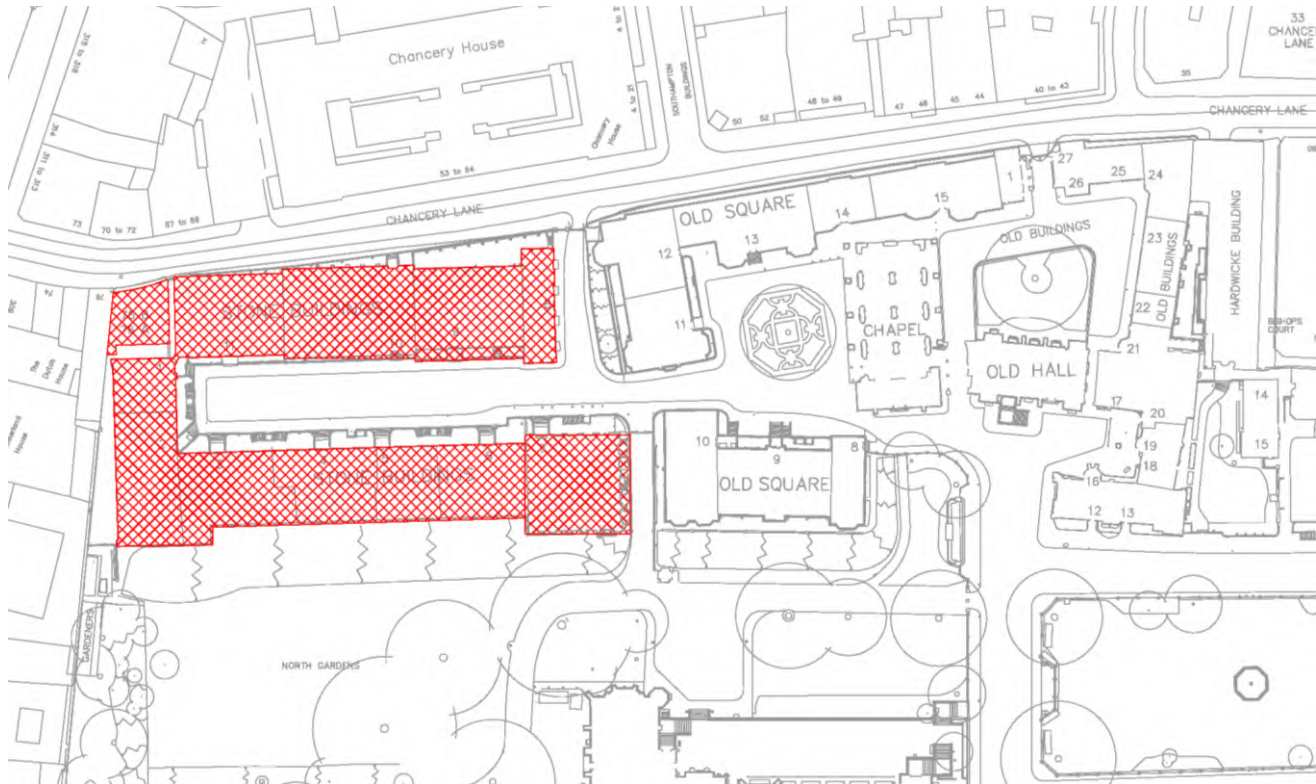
Area of Lightning Works Source: Ingleton Wood
